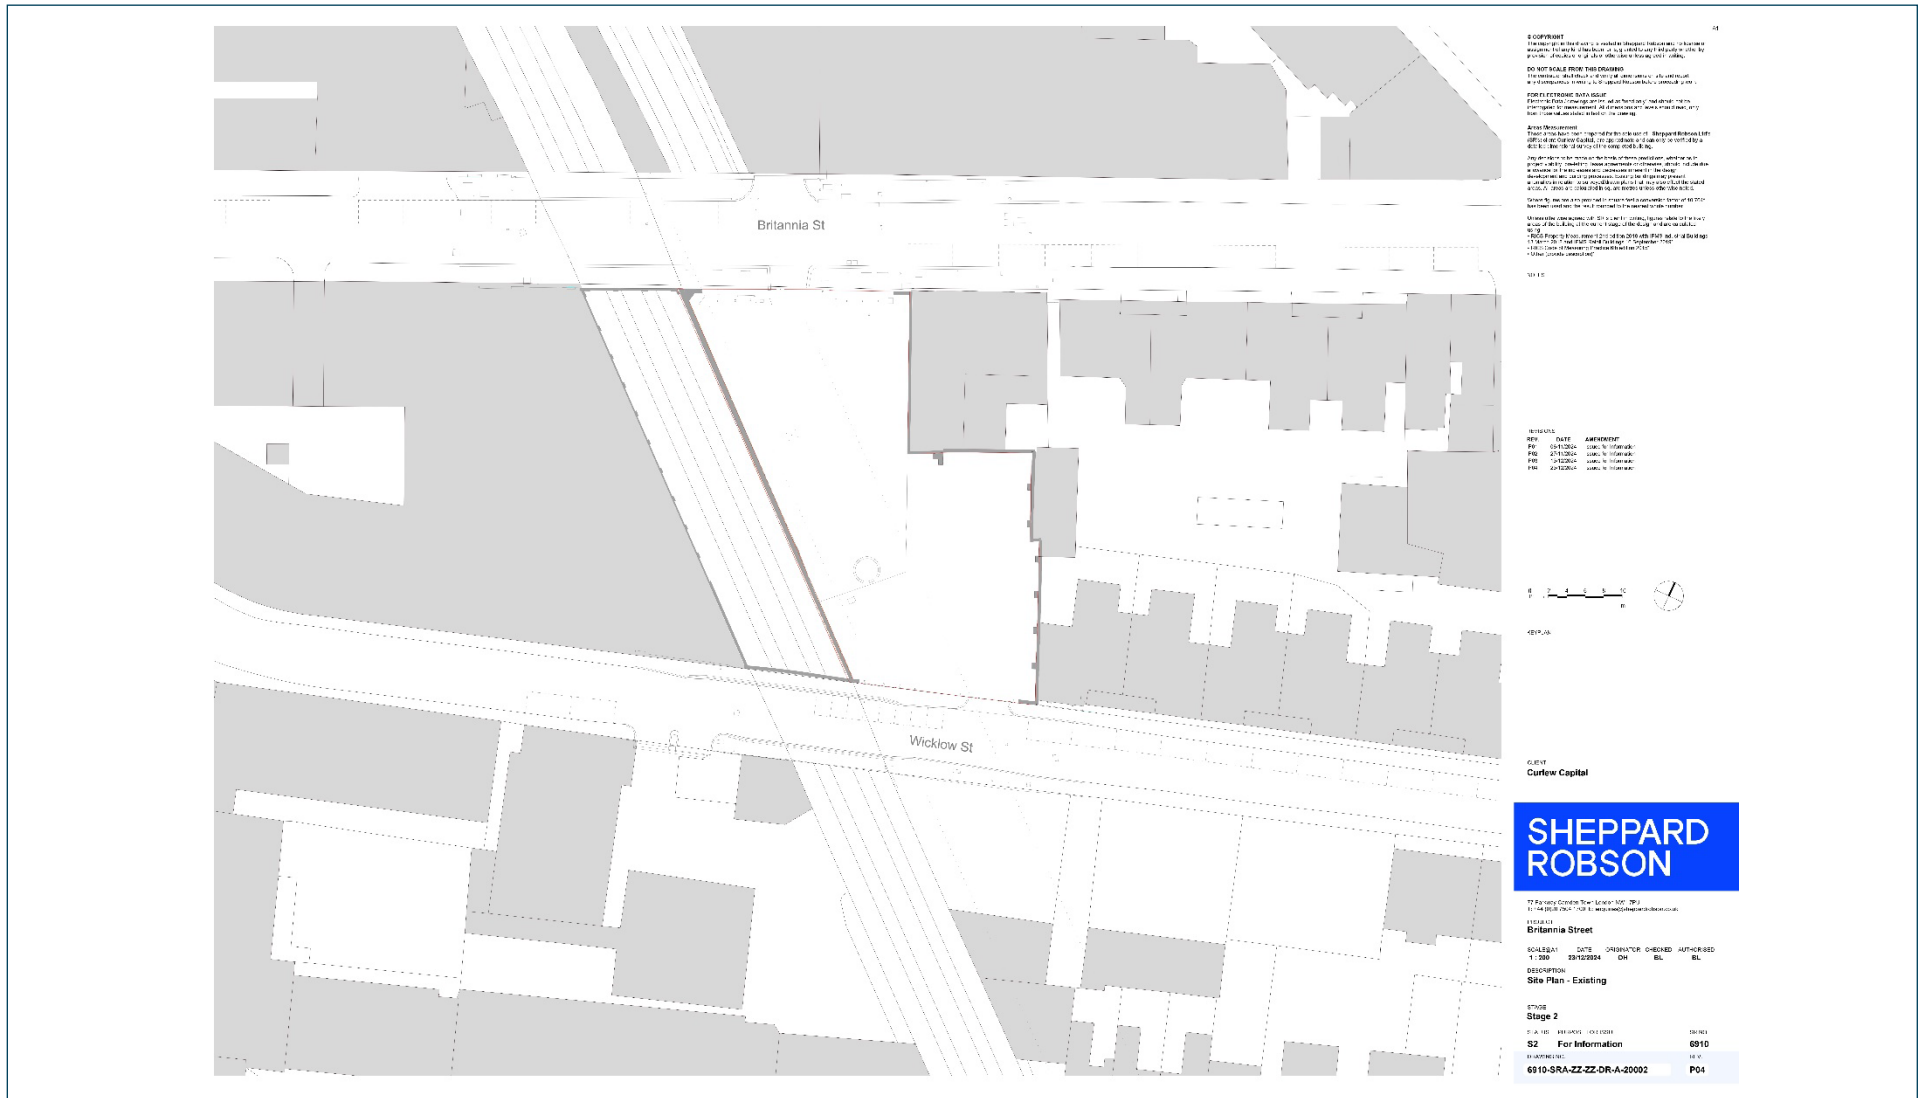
Figure Appendix A.1 – Proposed Site Plan (Provided by Sheppard Robson)
